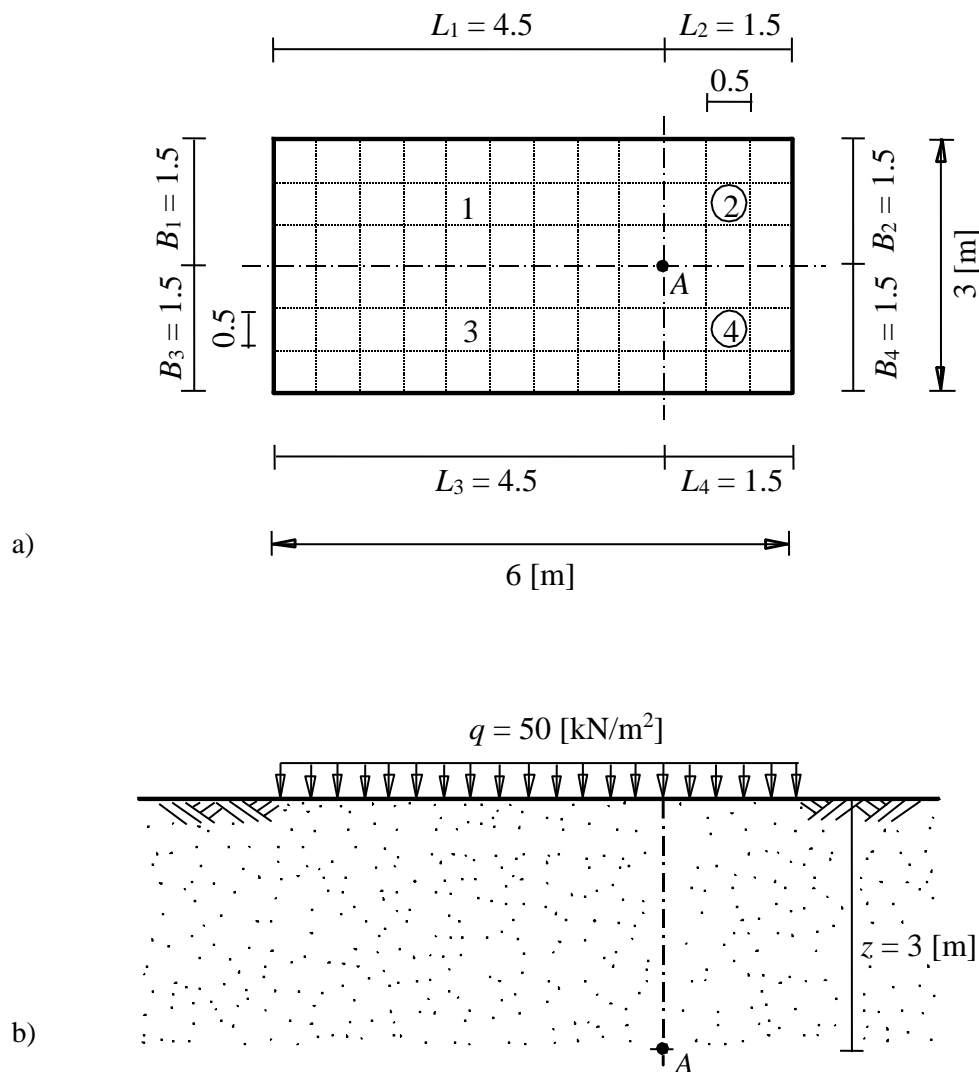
a) Plan of the loaded area with dimensions and FE-Net
